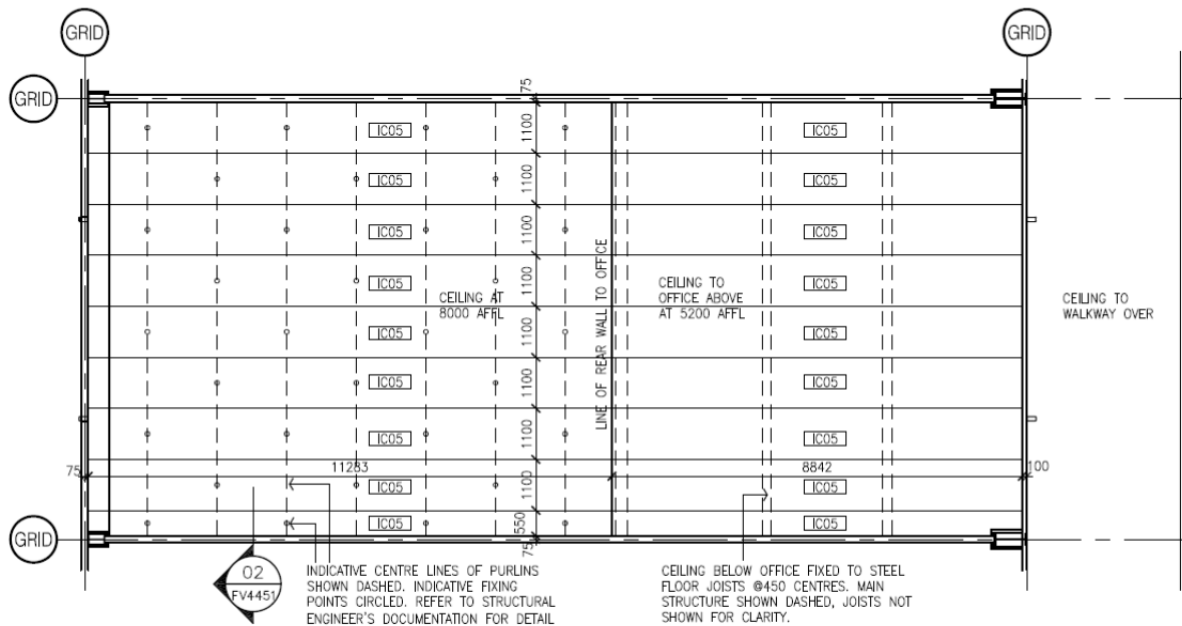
Indicative PIR panel ceiling layout (large trading store)
